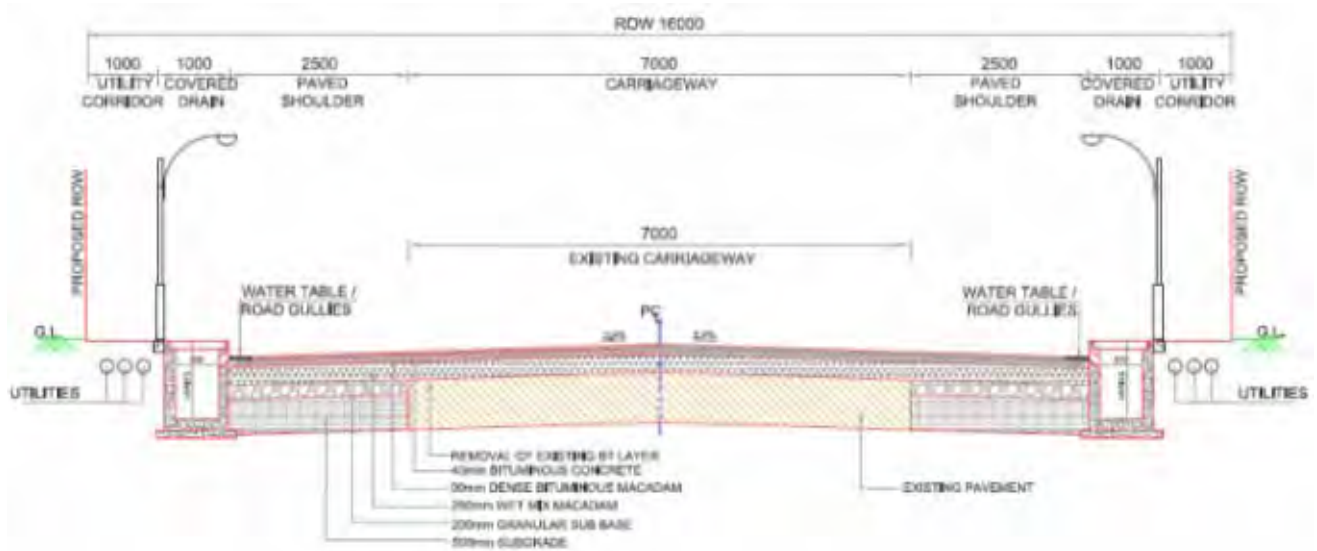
C2-V-R (P) : Two Lane Carriageway with Paved Shoulder in Village Area (Partial Depth Reconstruction)
